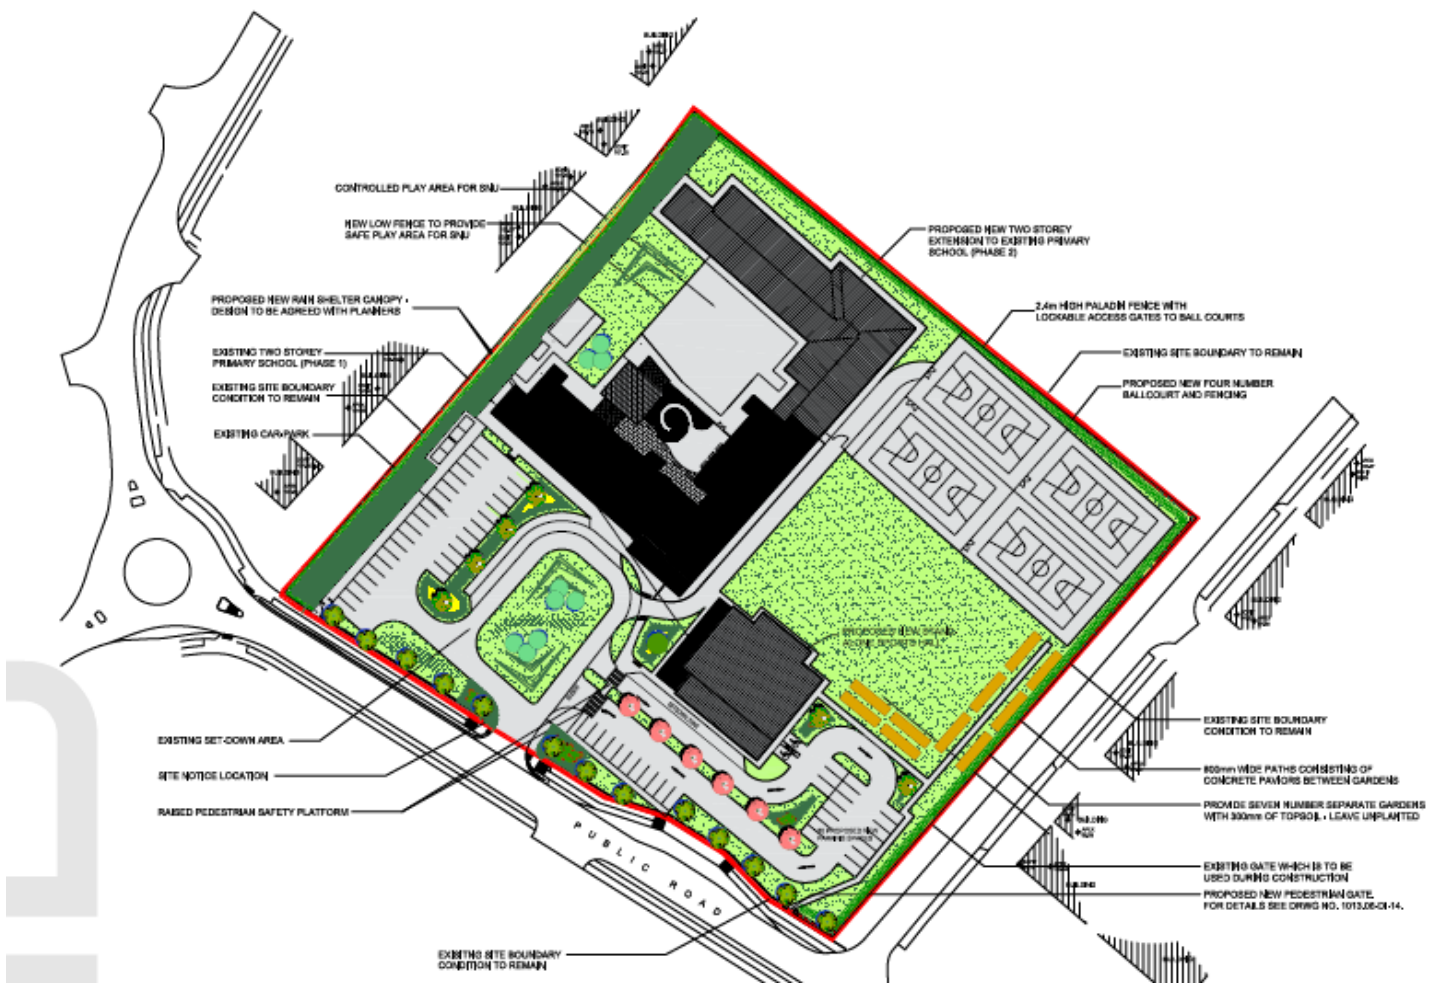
Site plan of Scoil Naomh Uilig, Rickardstown
